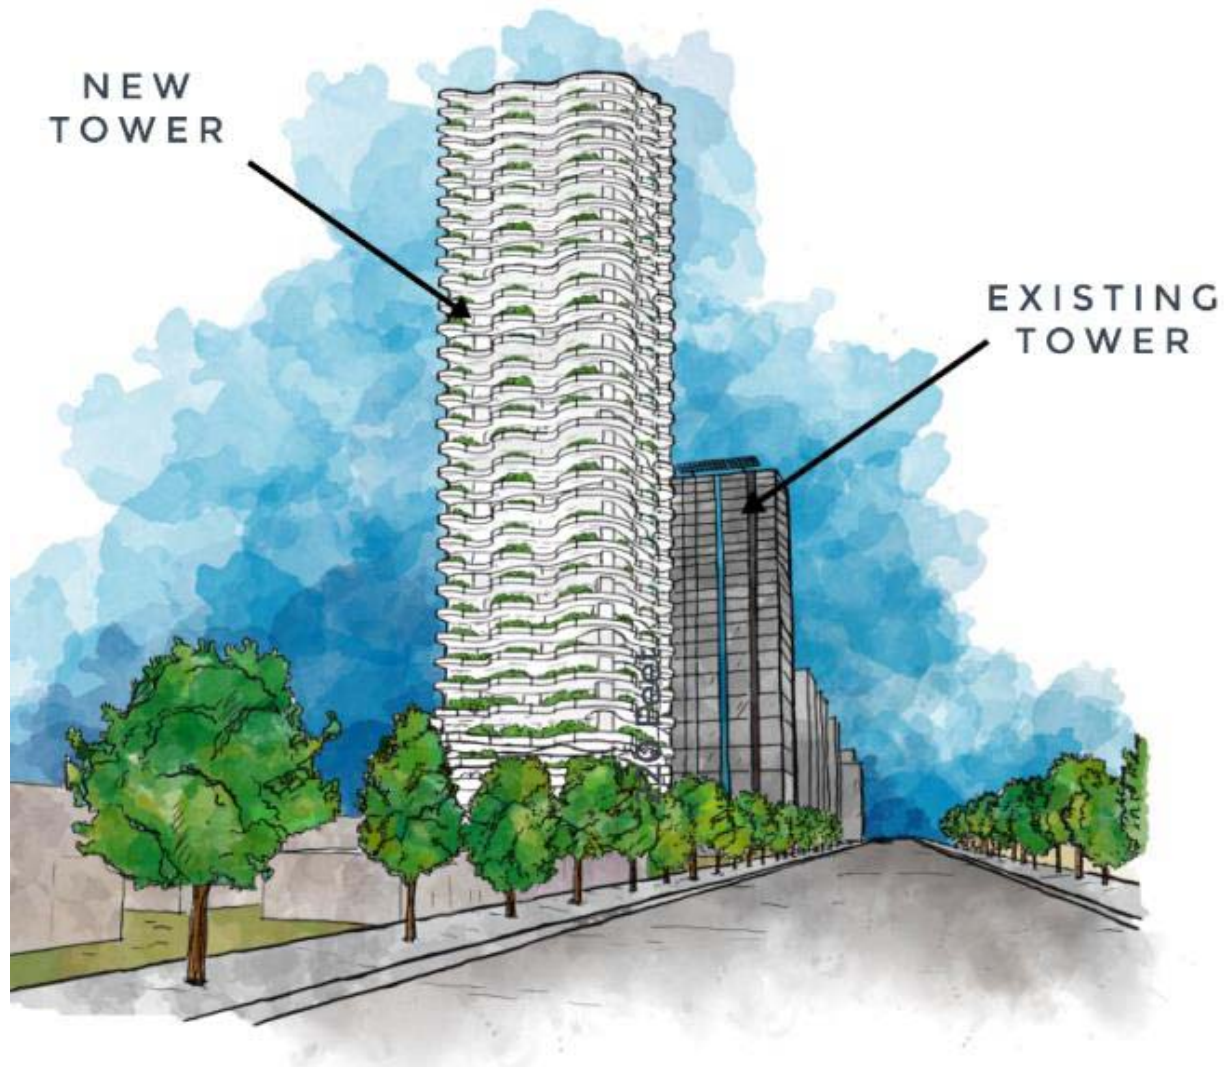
Option 1 involves razing the townhome section to build a new tower on top
